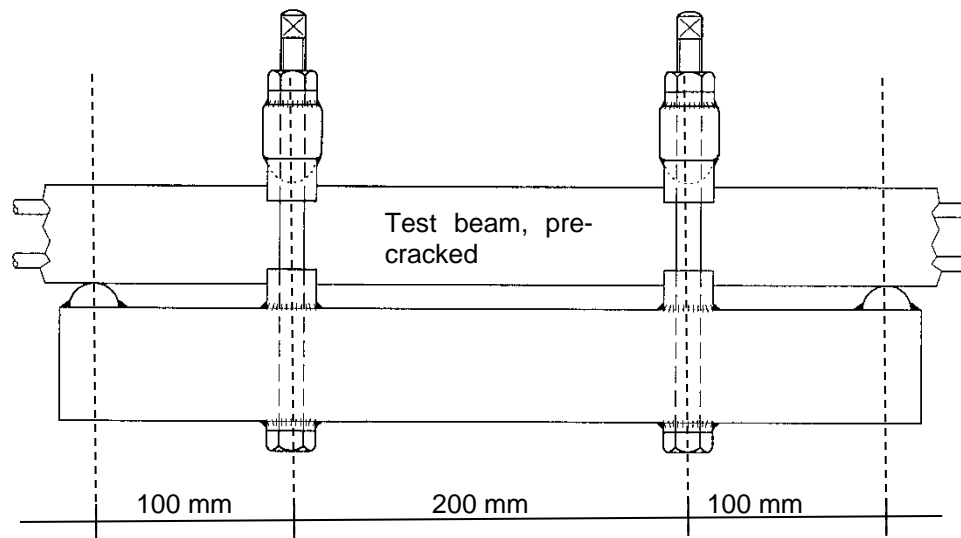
Example of test frame layout for loading beams. The deflection of the mid-point section of the test beam is used to quantify the loading.
